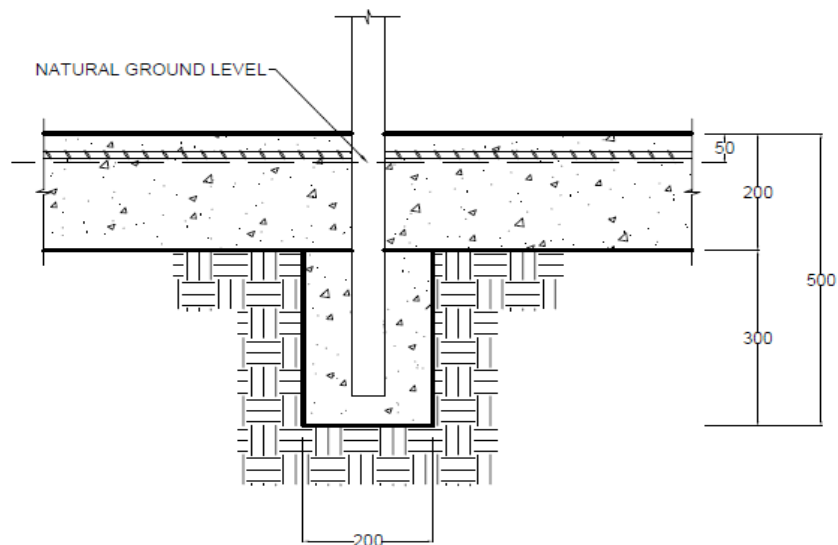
Indicative section of the proposed piers and strip footing (plinth)
